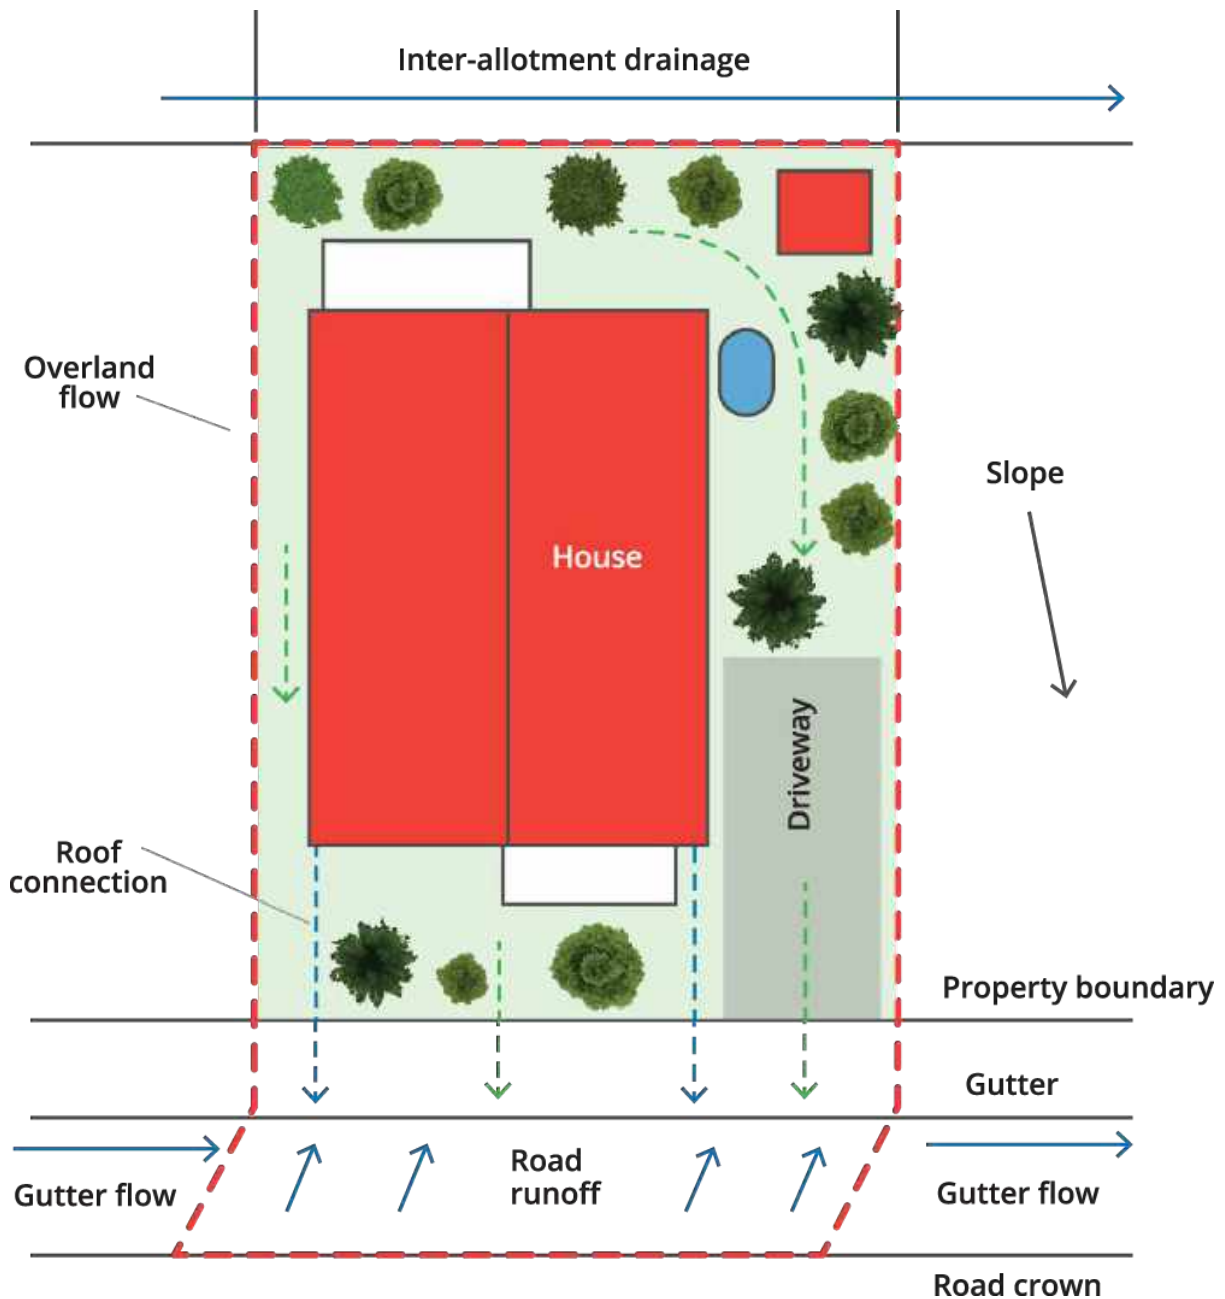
Stormwater Runoff from Roofs and Properties – Lot Scale Effects
